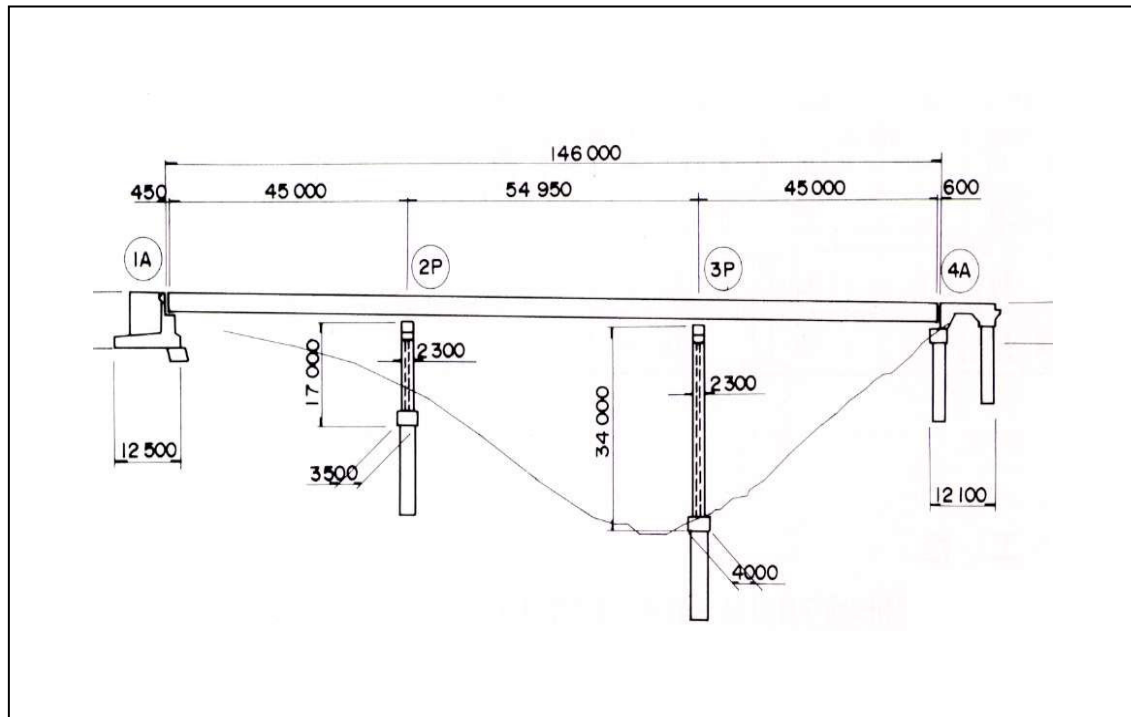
Side view of three-span continuous steel bridge with I-shape girders
